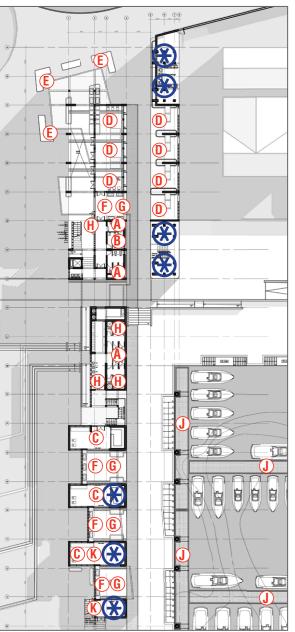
Ground floor plan showing position of water treatment and use processes
